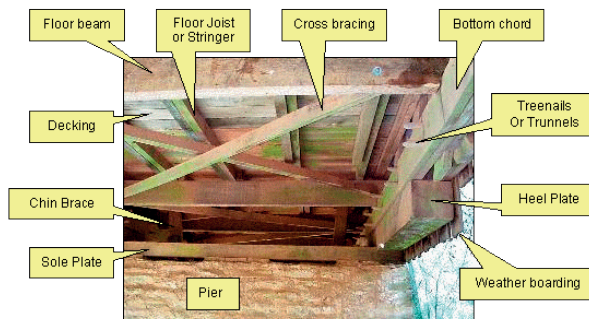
Example of a static system: a beam-bridge construction (view from underneath bridge).
